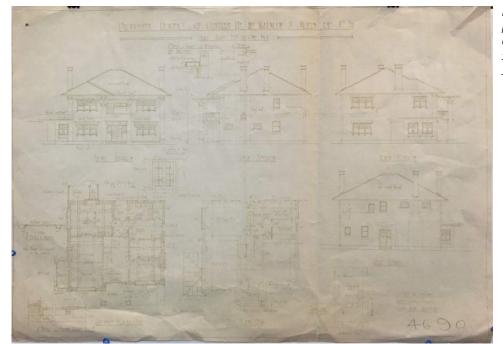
Architectural plans for proposed residence at corner of Glenferrie Road and Woodmason Street prepared by Schreiber and Jorgensen, 1924 (SHC MB3038)
